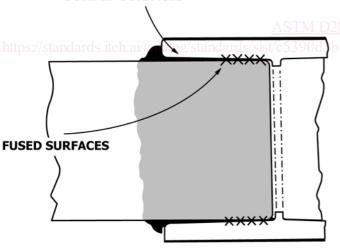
Bonded and Fused Surfaces of Joined Pipe
